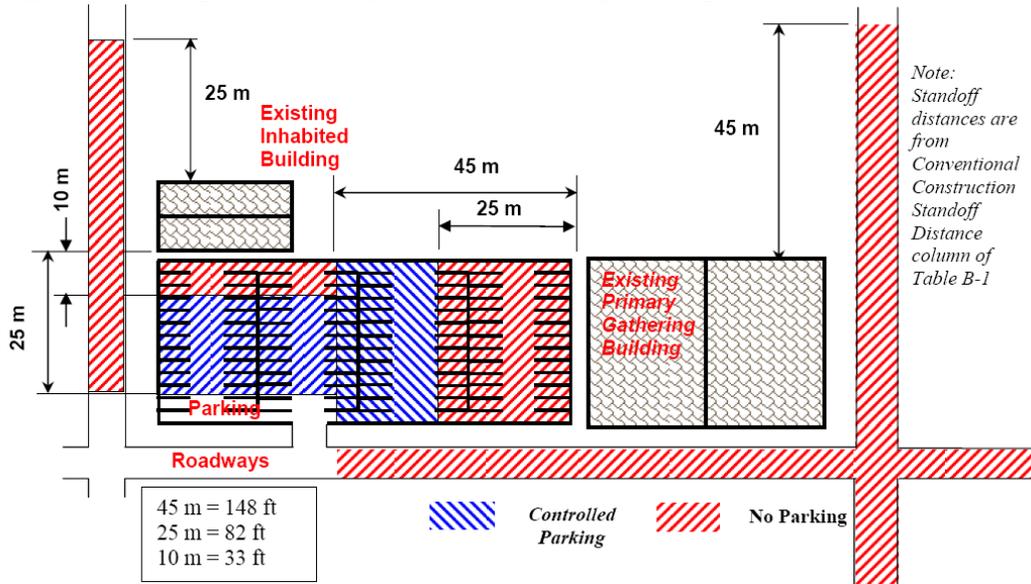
Parking and Roadway Control for Existing Buildings - No Controlled Perimeter
